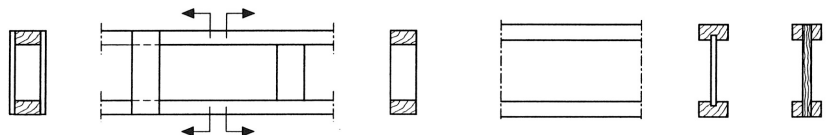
Cross-sections with two flanges and discrete or continuous connection.
